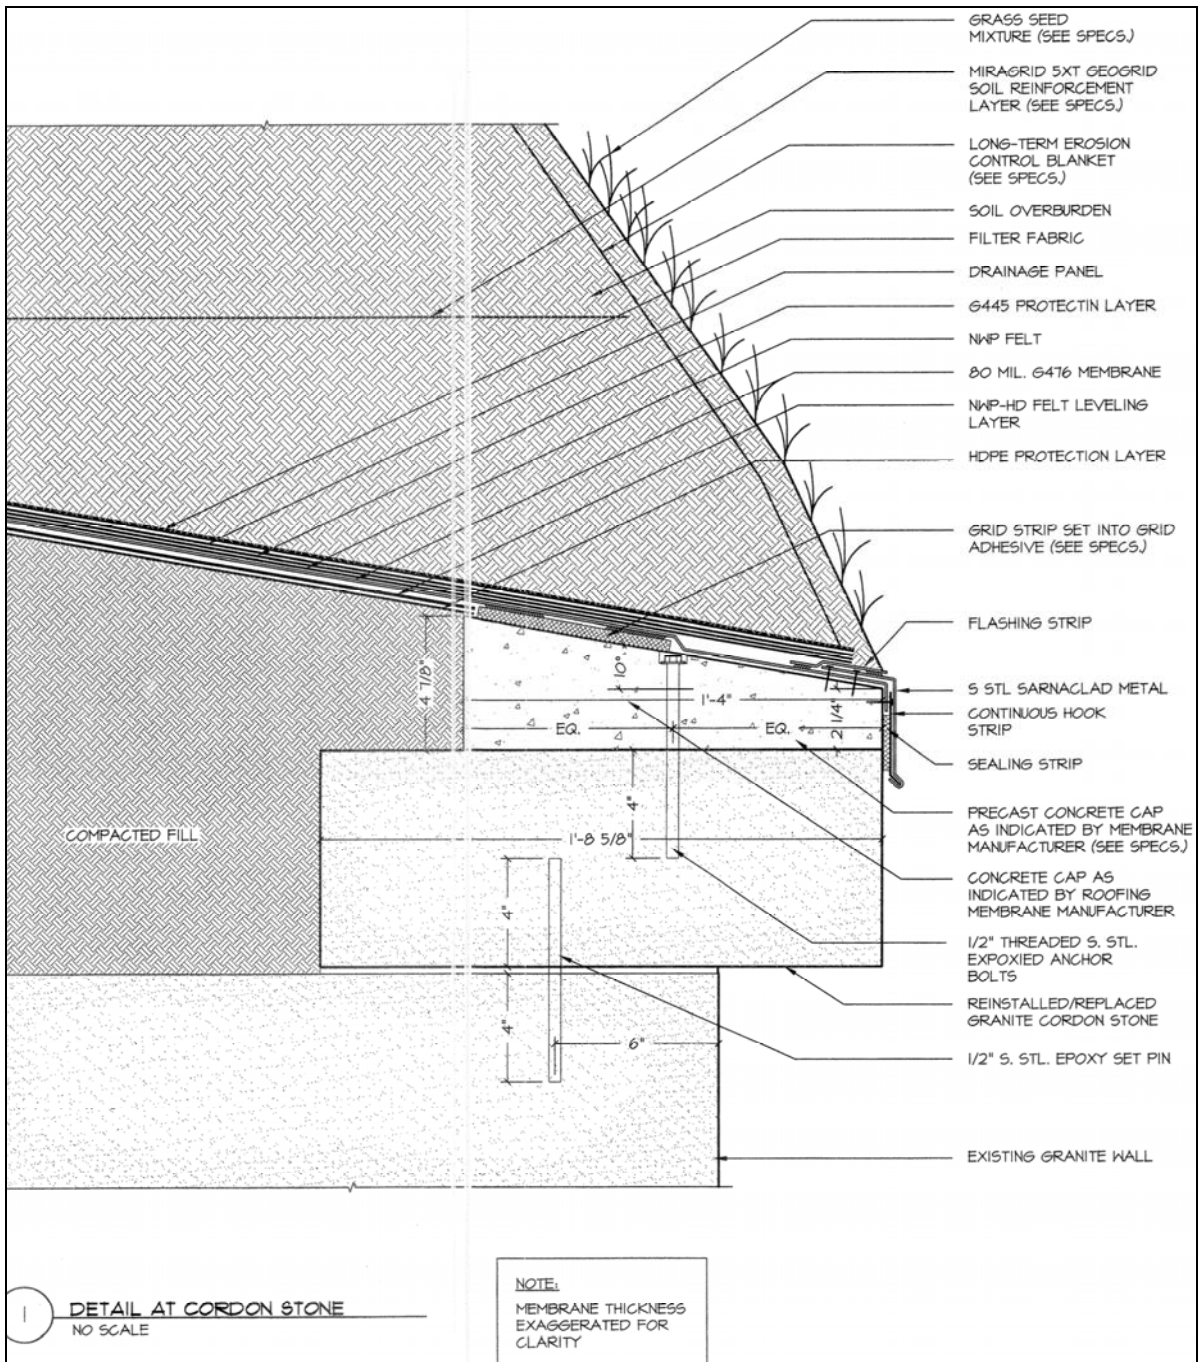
Detailed view looking at the profile of the earthen rampart at Fort Adams, Rhode Island.
